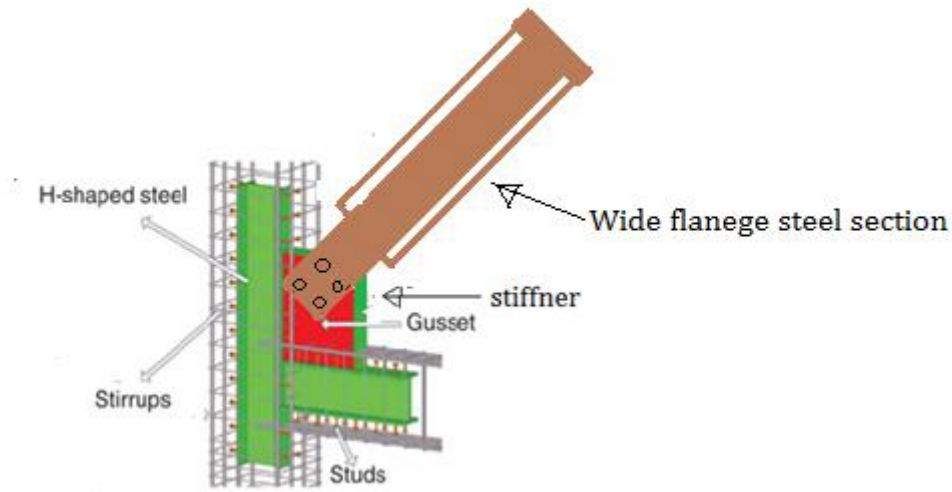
Wide flange Steel Bracing connection with RC frame.
